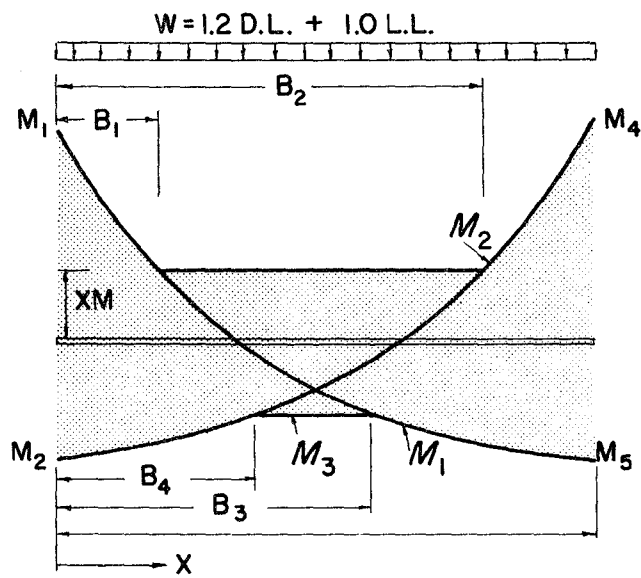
TYPICAL DESIGN MOMENT ENVELOPE
